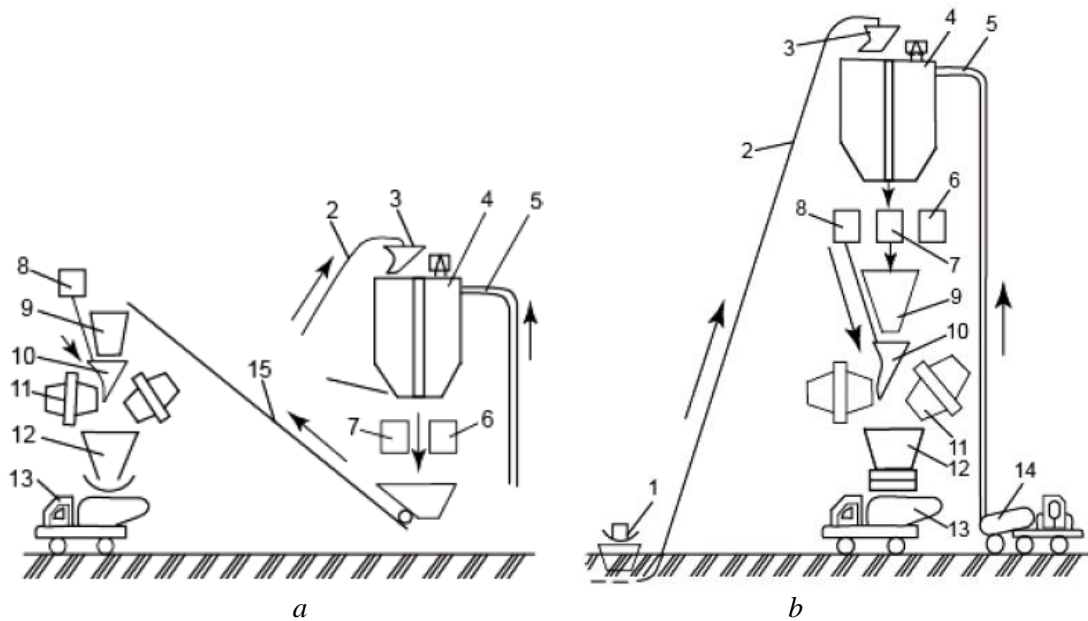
Layout schemes of equipment of concrete mixing factories, plants and installations
